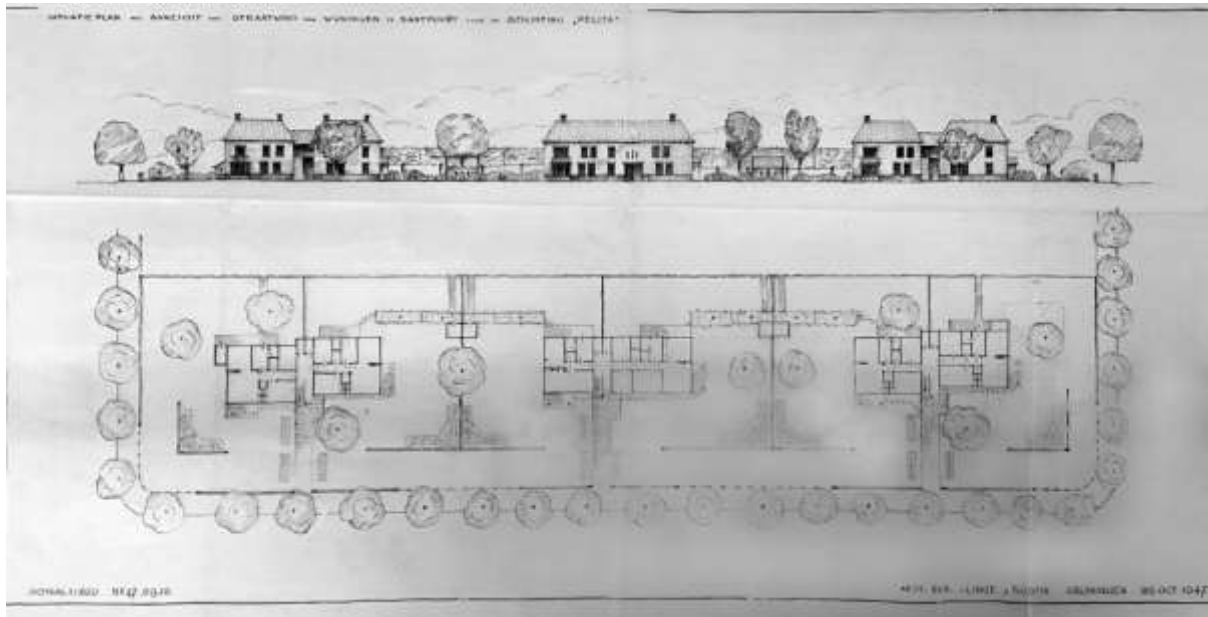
Situation and elevation of Pelita-houses in Santpoort (Van Linge, 1947-1951)
